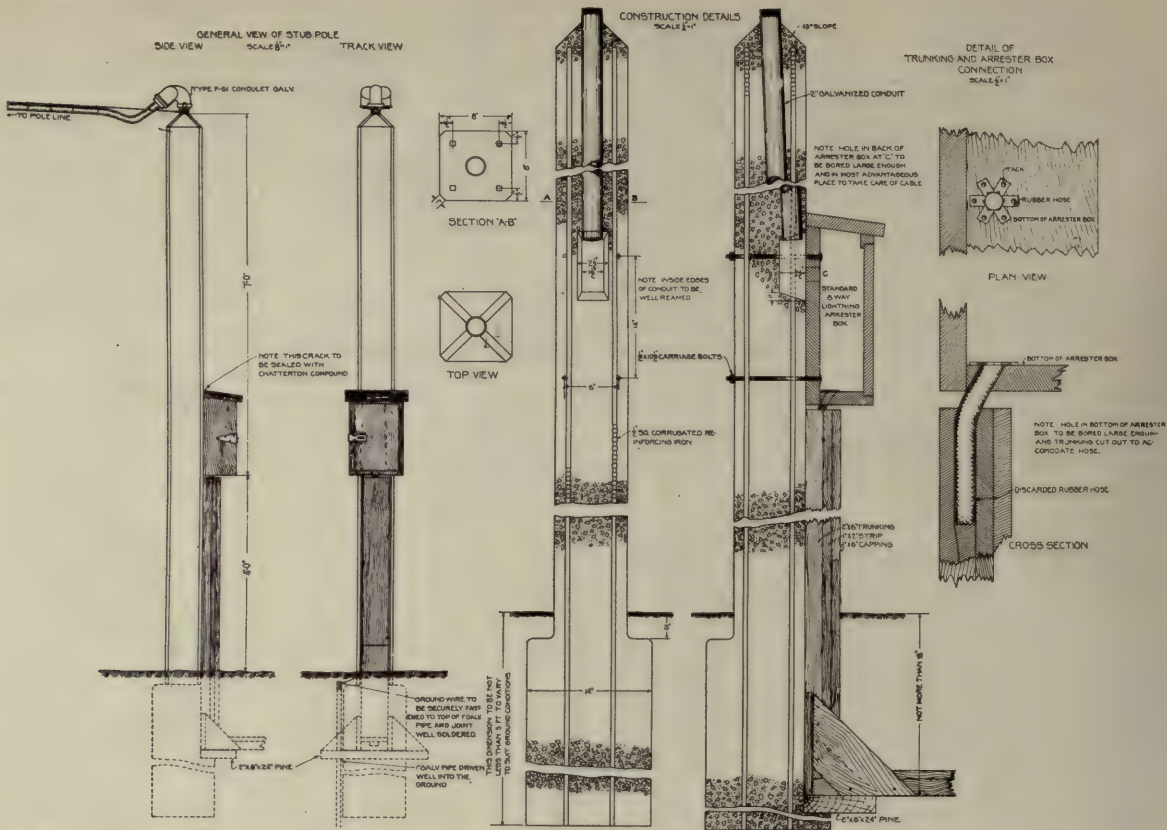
Relay Box, Stub Pole, Foundation, Trunking Connections and Details. Atchison, Topeka & Santa Fe.
